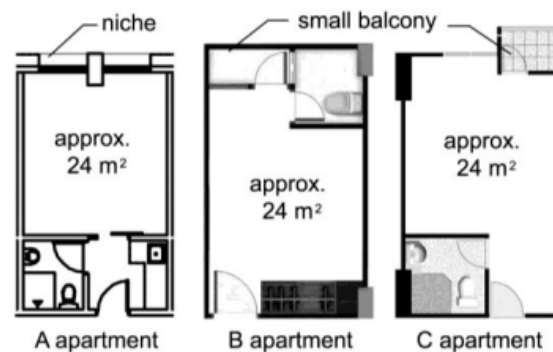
The room dimensions and layout of A, B and C apartment units.
